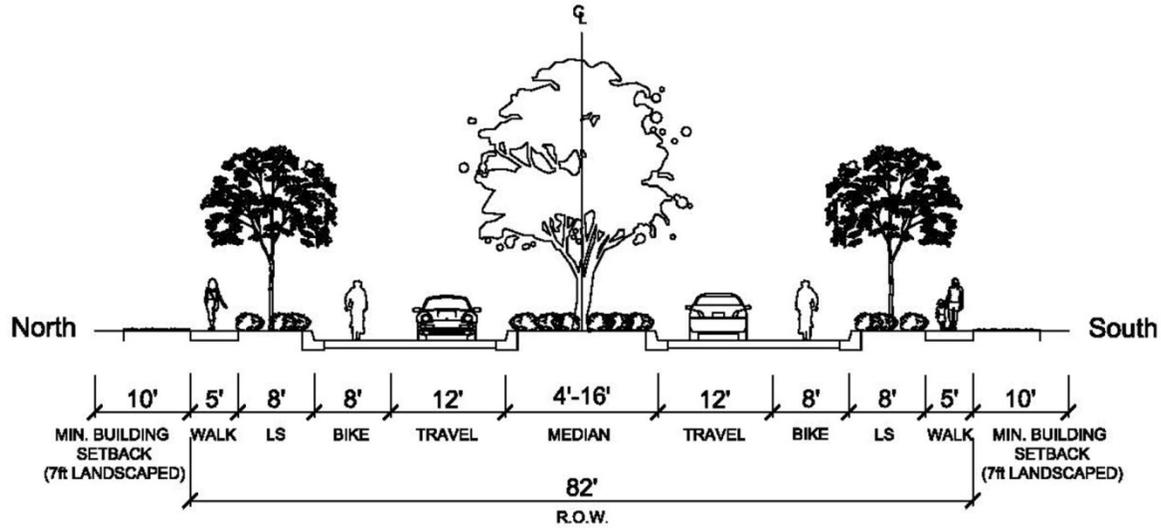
Moffett Drive – Eastbound from Park Avenue to Jamboree Road (Local Collector)
